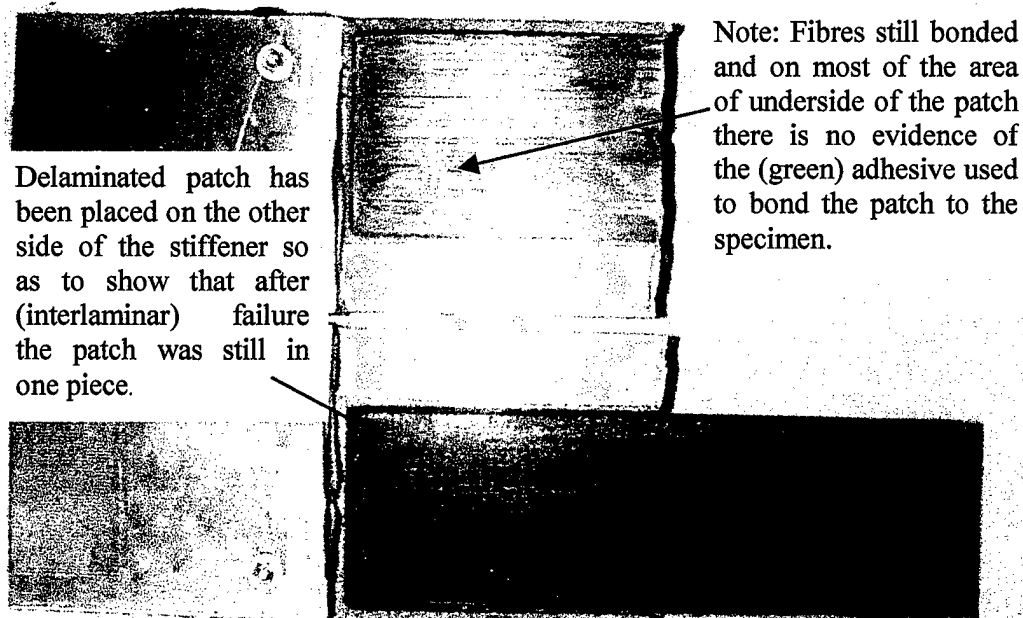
Close up of failure surface showing the first ply attached to the skin as well as the doubler being in a single piece after failure.
